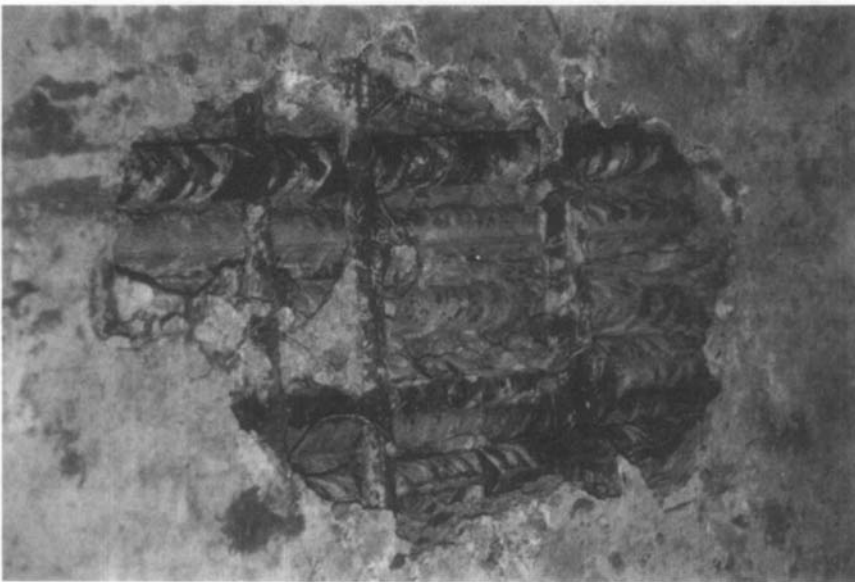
Defect A-C7: Delamination/spalling
